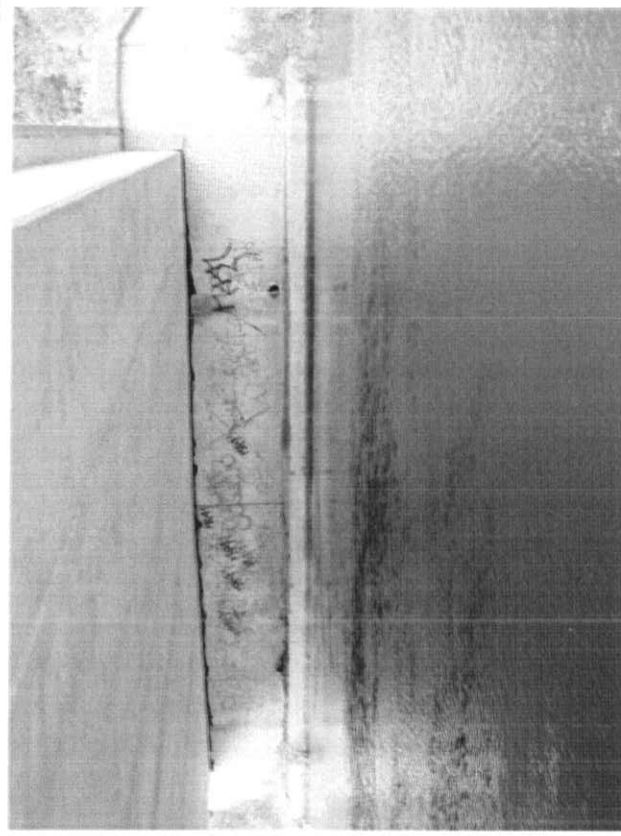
1-7/8" wide gap along the underside of the shear key between beams 7 and 8 at the west abutment.
